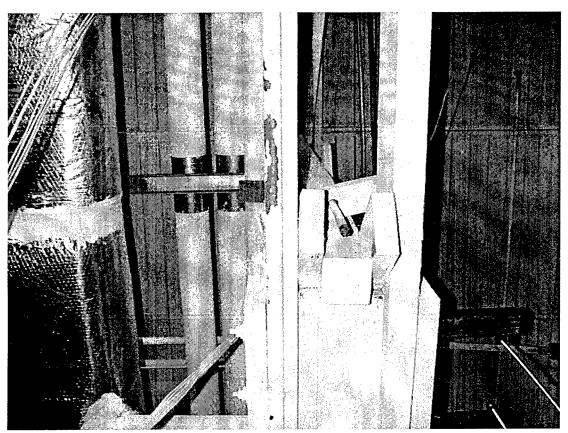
Cantilever pipe support on diagonal members of Truss 34, Area A.
